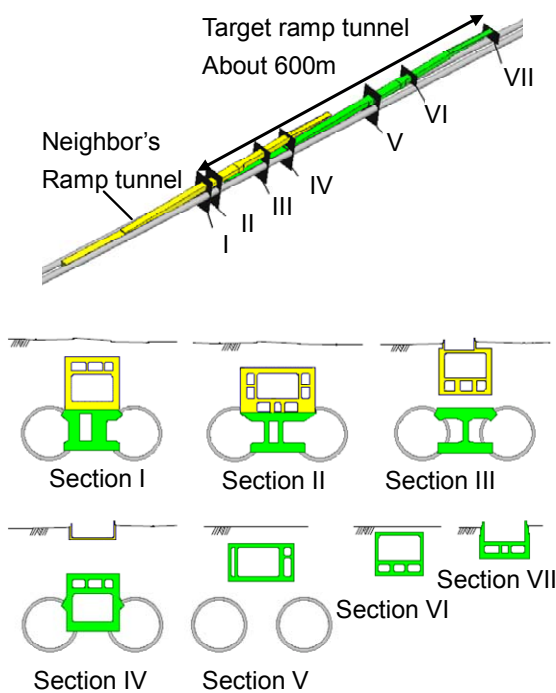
Overview of target ramp tunnel structure in the Tokyo Metropolitan Expressway Central Circular Route: the Yamate Tunnel.
